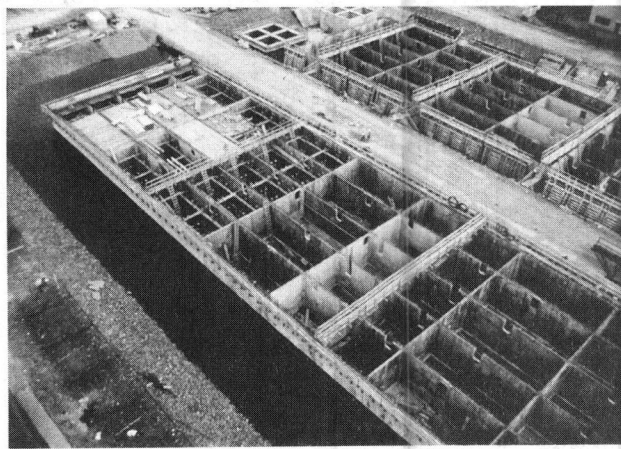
shows that the bottom slab of a pontoon had been completed and that wall forms were being erected. Figure 5 shows that a pair of pontoons was
